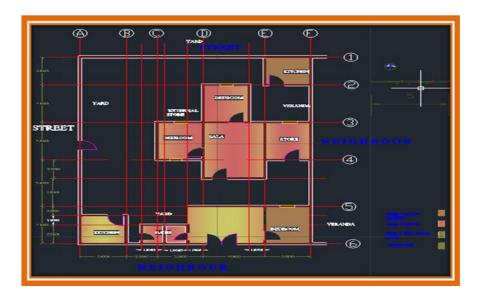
Mohammed Ali Mohammed House ground floor plan (Source: Author)
